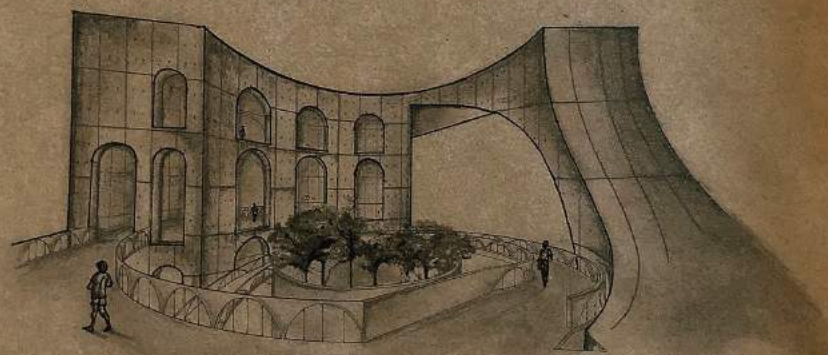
Digitally Fabricated Door way & Over bridge section.
